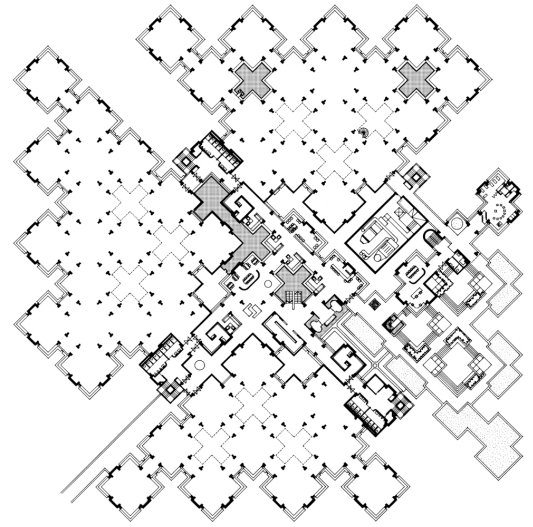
Plan of ground floor (Hertzberger, n.d.-a)
